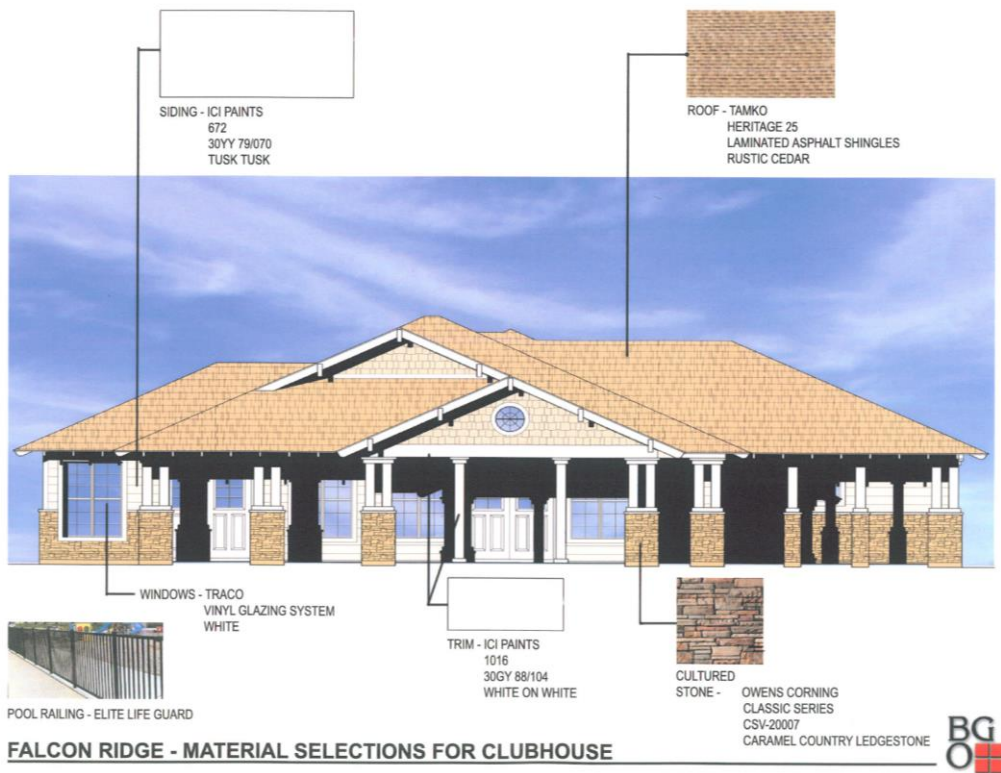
Typical Building Elevation 1Figure B-6: Typical Building Elevation 2
